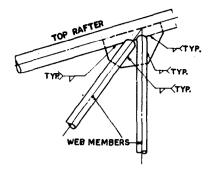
DETAIL R7 FOR LEAN- 10 ROOF TRUSS
